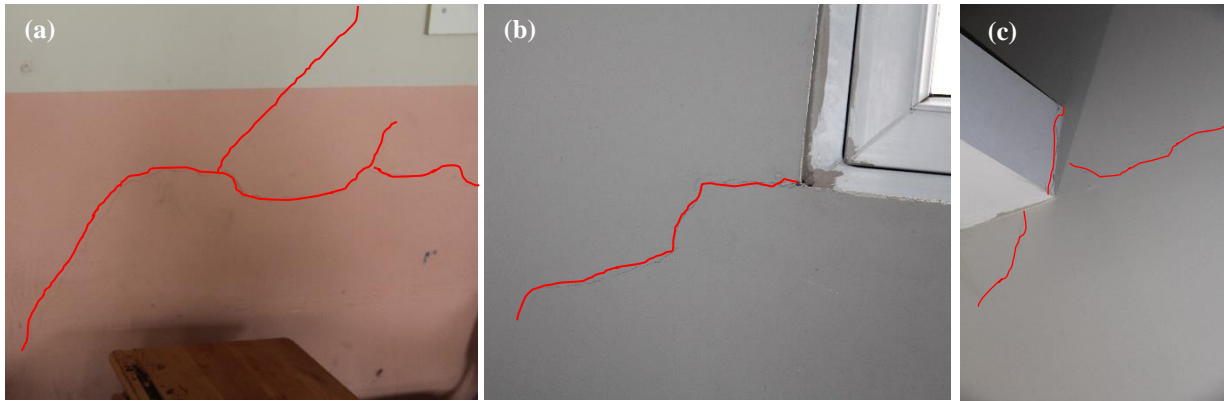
Damages on the non-load-bearing elements: (a) partition walls; (b) window edge; (c) beam-wall joint
